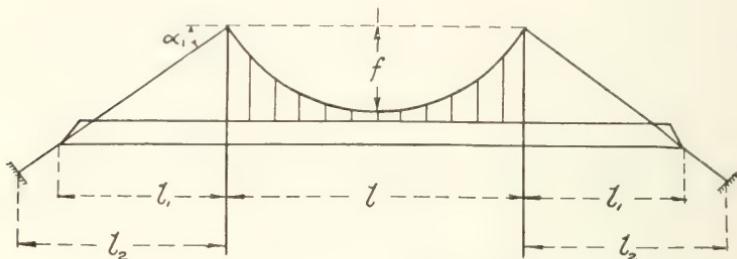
Continuous Stiffening Truss with Straight Backstays.
